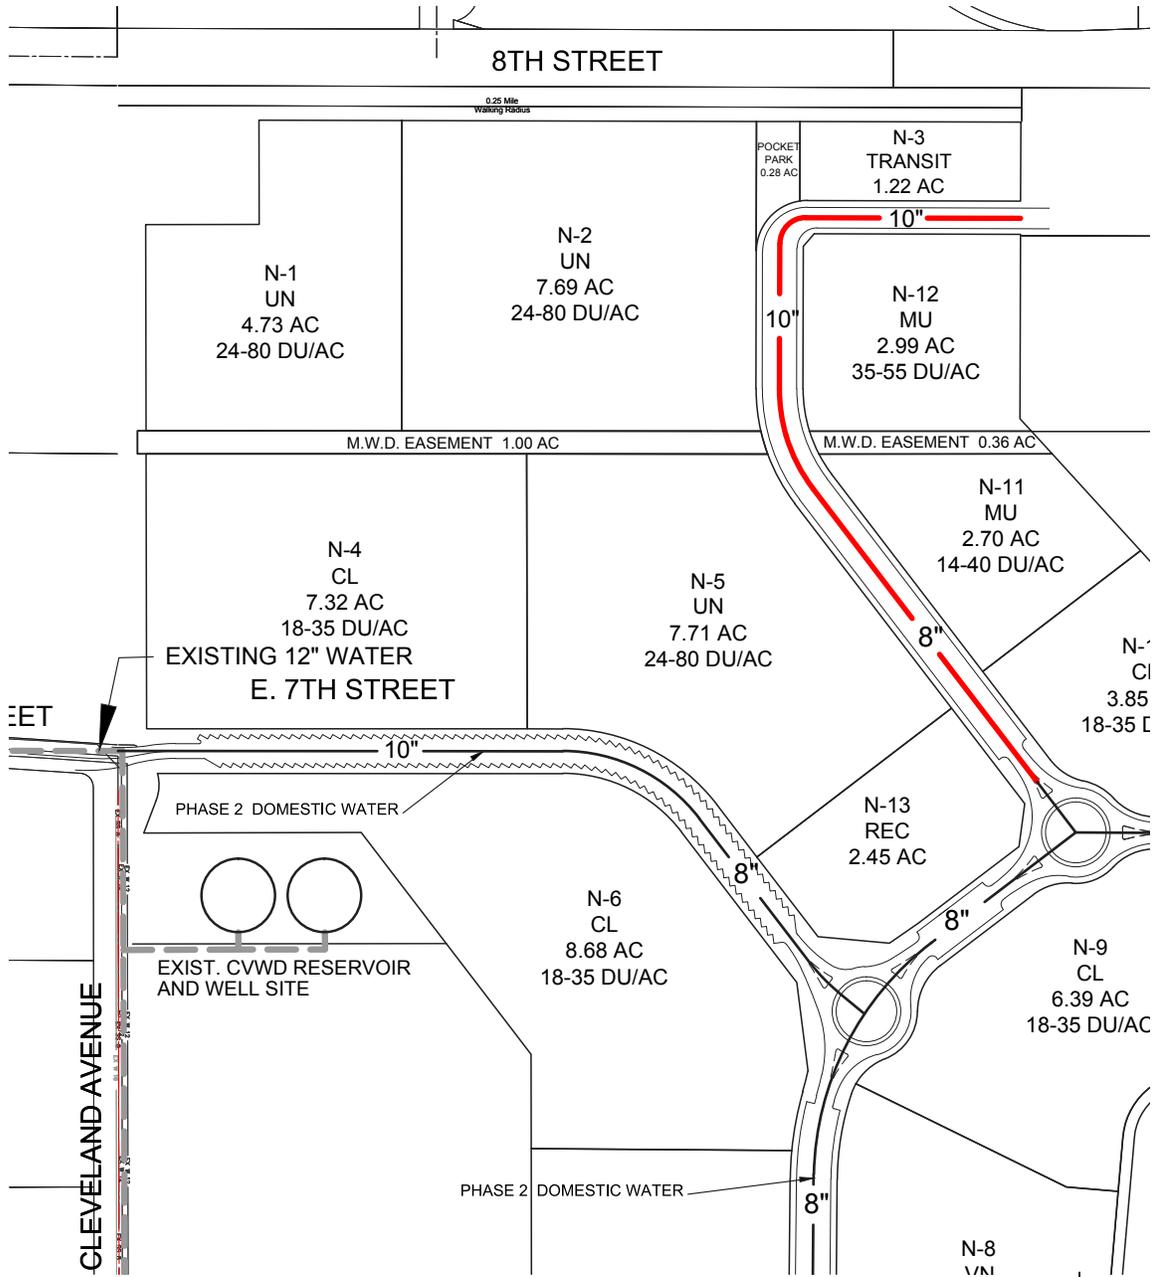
Conceptual Phase 3 Domestic Water Facilities Plan
